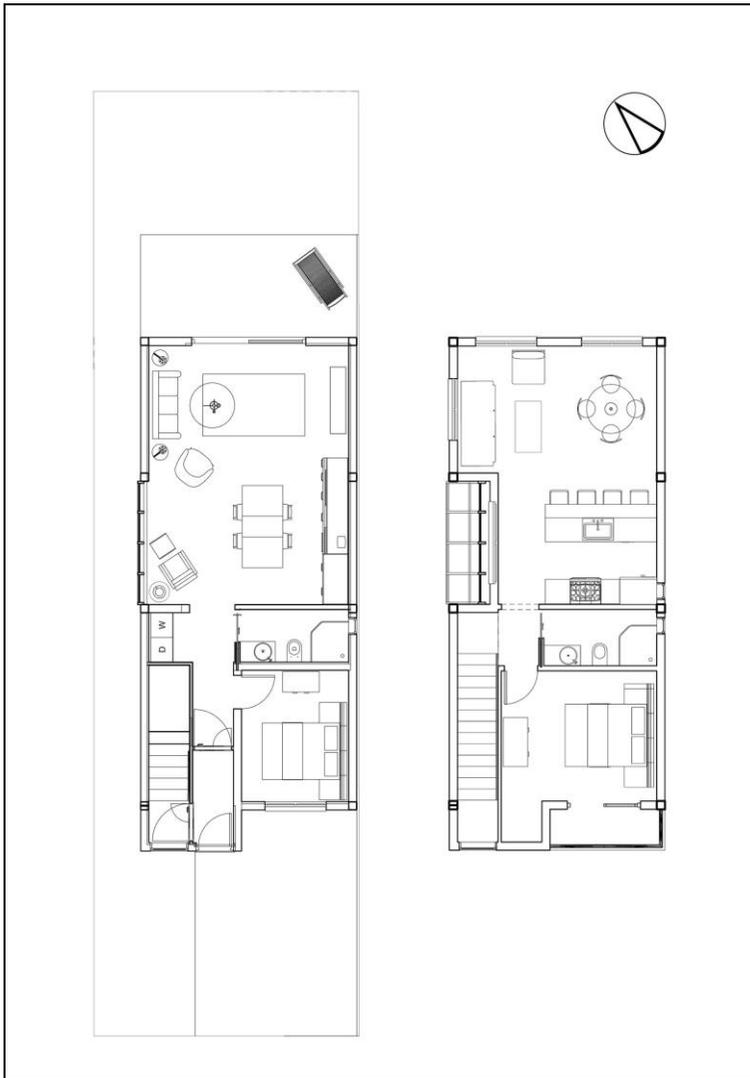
Ground floor furnished plan (left), first floor furnished plan (right)
